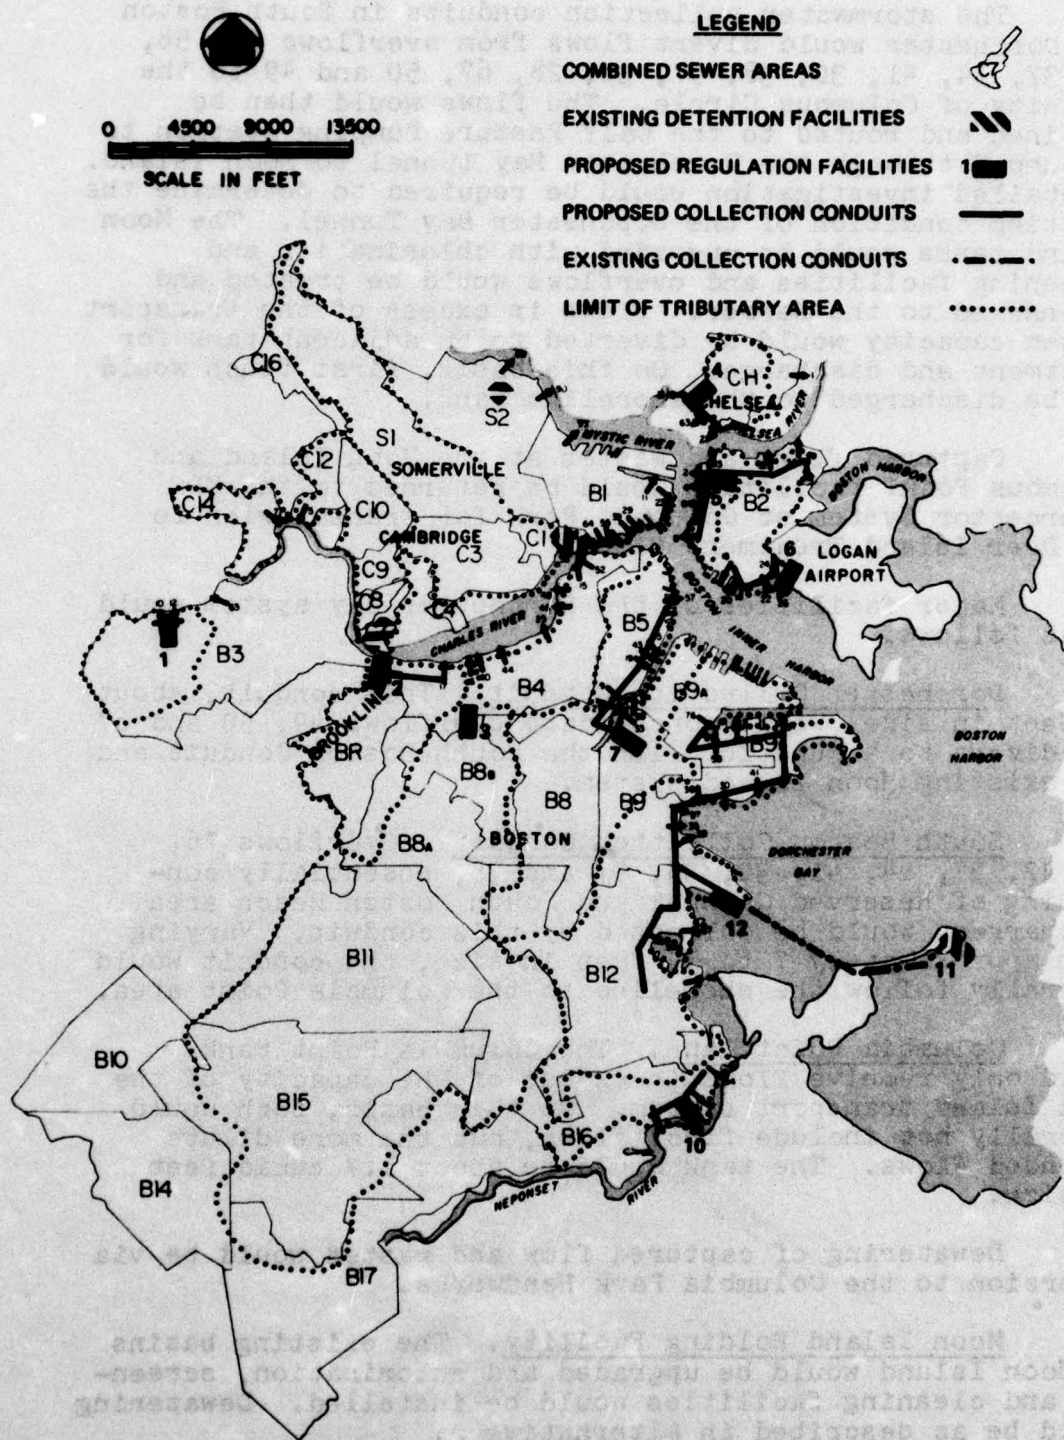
MODIFIED MOON ISLAND PLAN WITH SATELLITE REGULATION FACILITIES AND COLLECTION SYSTEMS IN ALTERNATIVE 3
